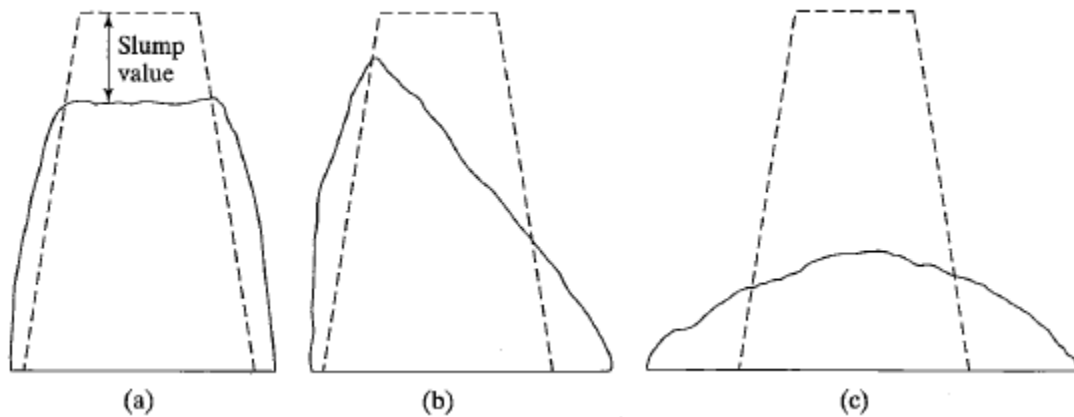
Types of Slump (a) True Slump, (b) Shear Slump, and (c) Collapse Slump (Mindess et al. 2003)
